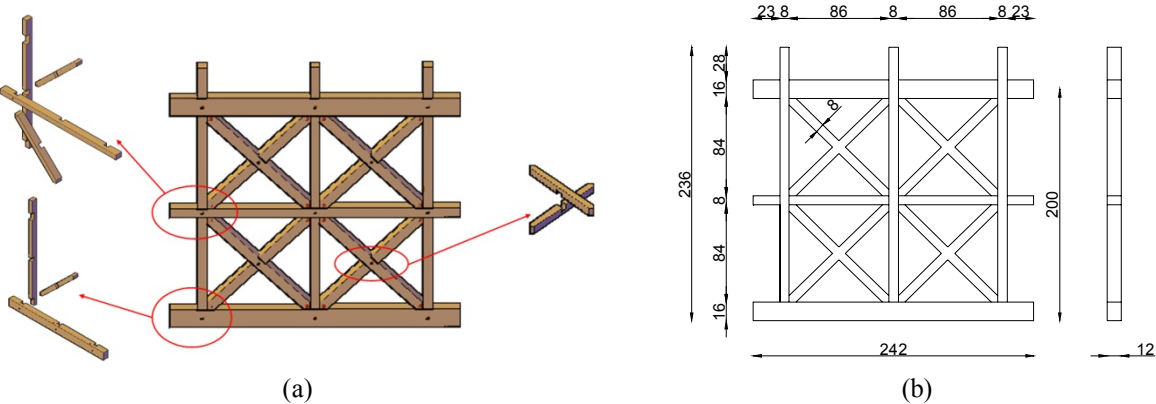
Wall specimens: (a) connections used; (b) dimensions of elements in cm
